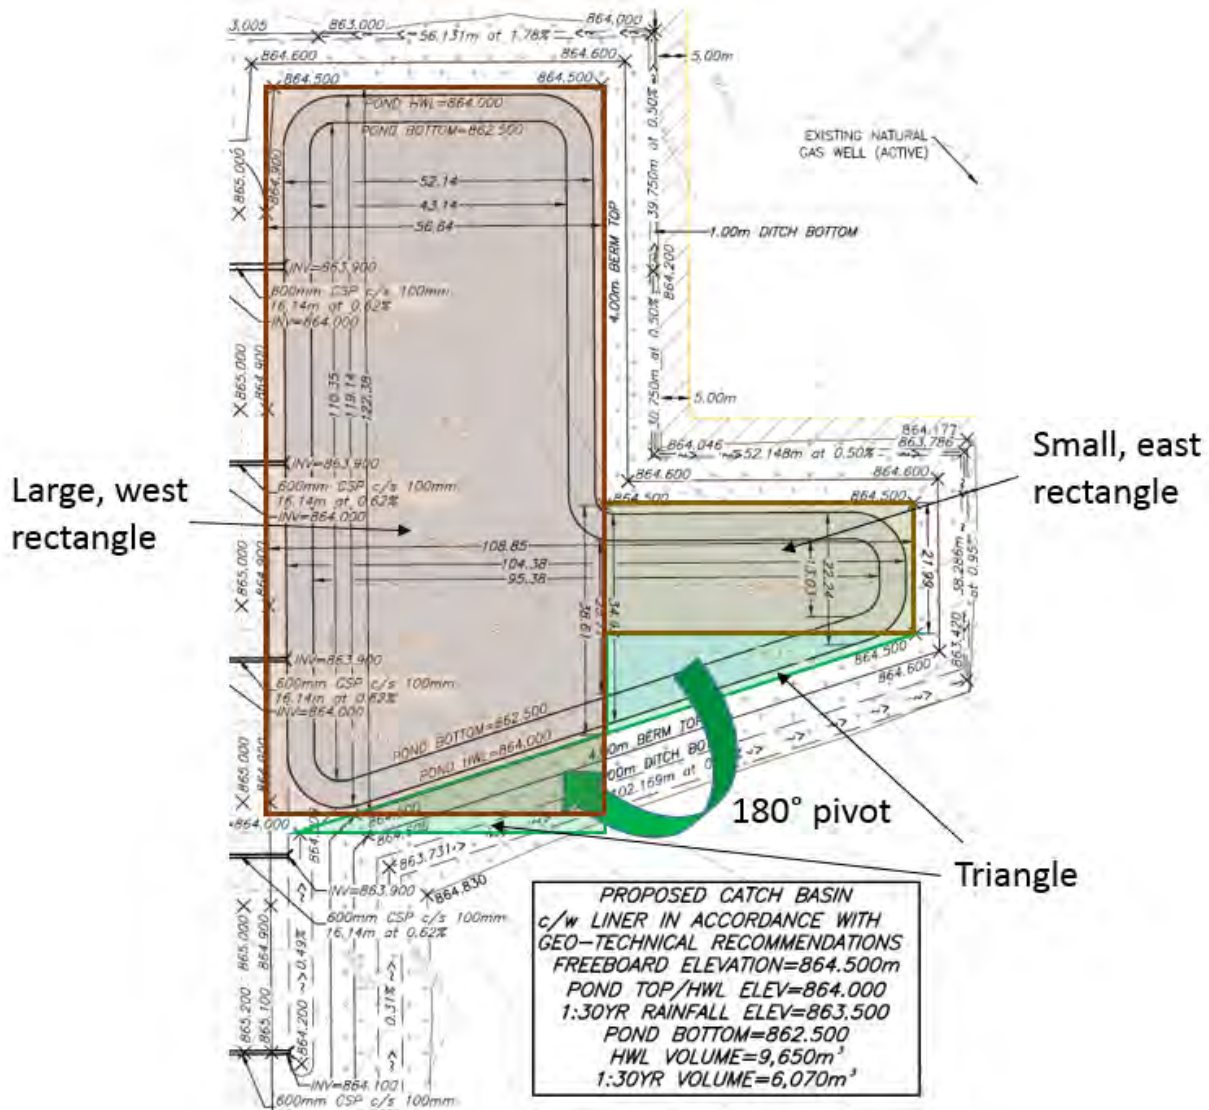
Irregular shape catch basin. Al-Terra Engineering (Red Deer) Ltd., Site Grading Plan Sheet C02. #5, 2022-02-23. Color shading and labels added.
